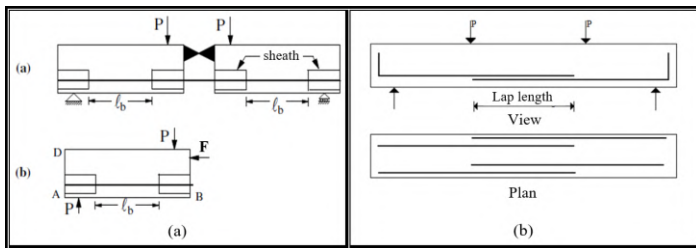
The beam test setups: a) Standard Belgium Hinged Beam test setup, b) Beam Cracking test setup (Tuğrul Tunç, 2020).
